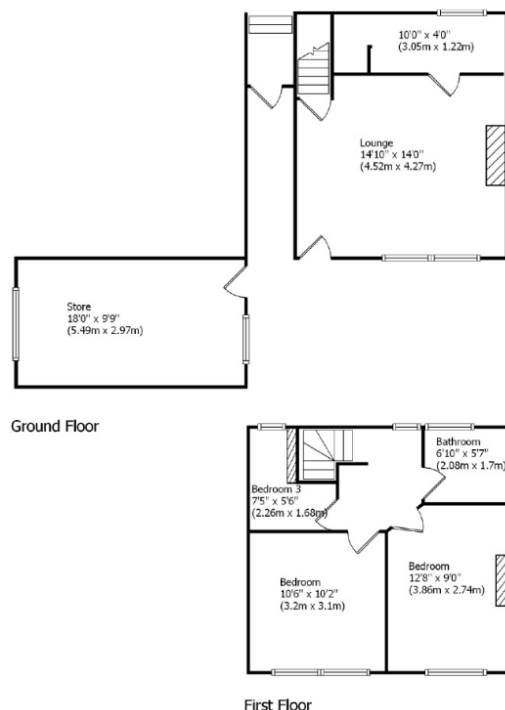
1 Water Street floorplan (as sourced from a Rightmove listing believed to be from June 2014)
